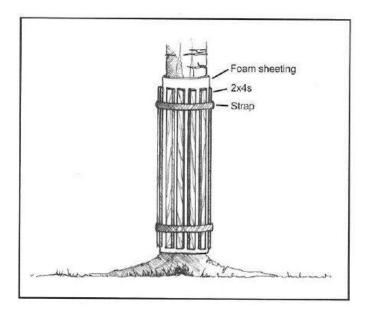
Trunk protection structure (from Fite and Smiley, 2008)
